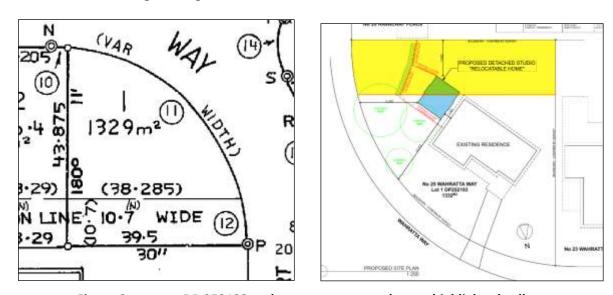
extract DP 252193 and easement encroachment highlighted yellow
